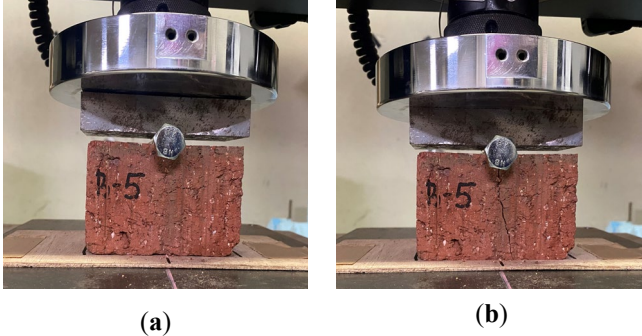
Photo of dowel-bearing test of brick. (a) Specimen before experiment; (b) Failure of specimen.
